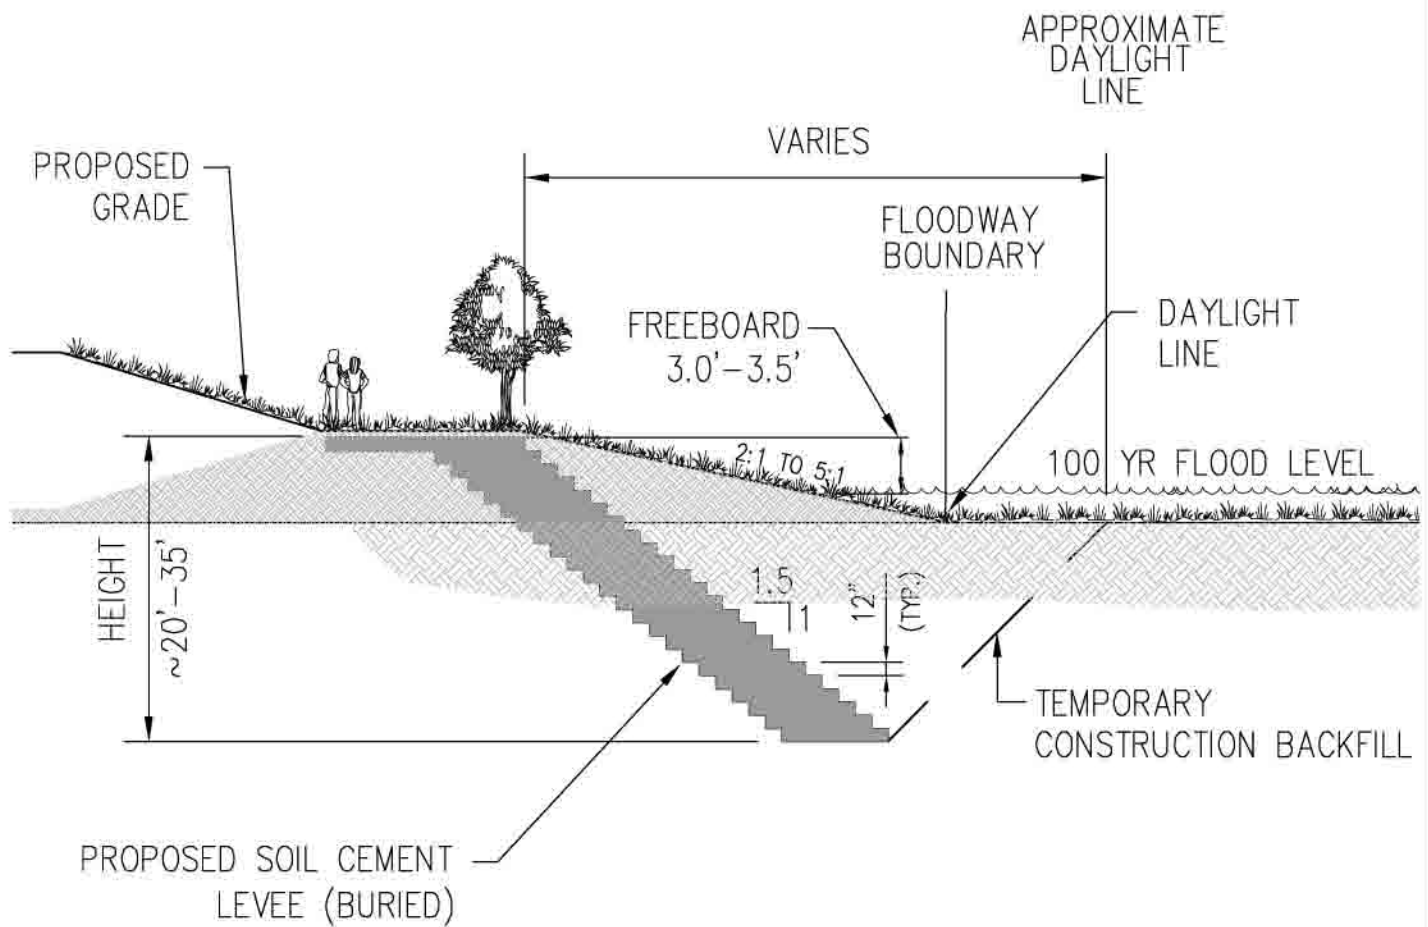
depicts soil cement bank protection extending about 6,400 feet downstream (west) of the Long Canyon Road Bridge along the southern bank of the River. The bank stabilization proposed downstream of Long Canyon Road Bridge is necessary to mitigate impacts associated with the Landmark project. An additional approximately 1,200 LF of soil cement bank stabilization is located approximately between STA 950 and STA 5700, downstream of the Project site, and is designed to protect the WRP. The bank stabilization related to the WRP was approved and analyzed at a project-level with the Newhall Ranch EIR.
